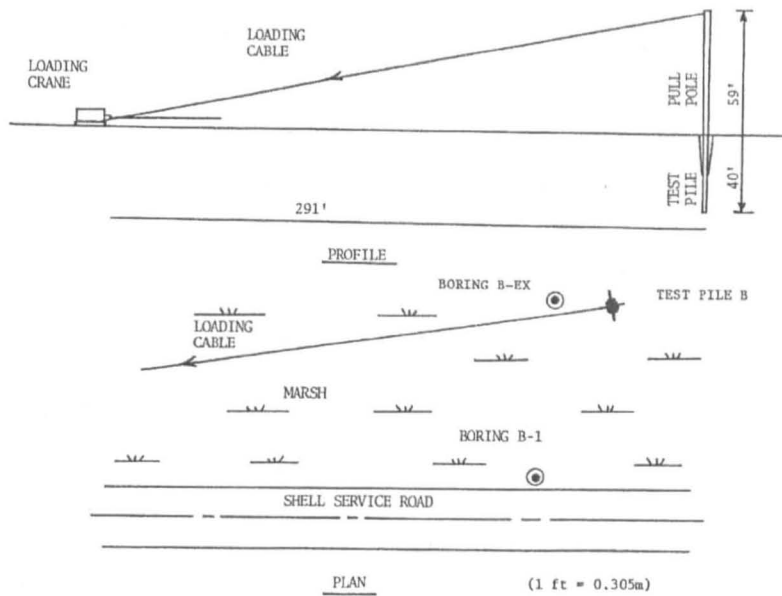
(a) Arrangement of a lateral loading test of a finned pile (source: Lee and Gilbert, 1980)
